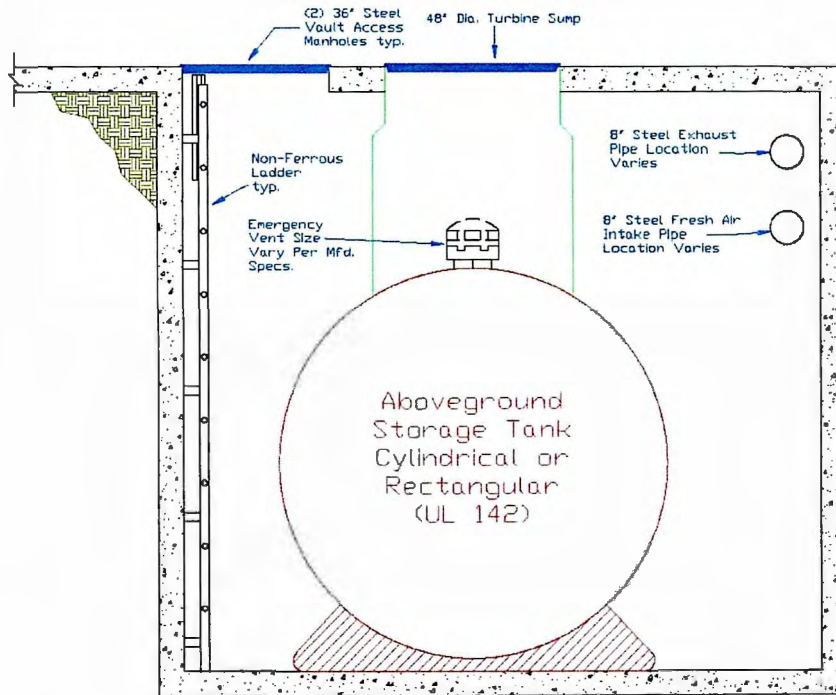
Sectional Views of Typical Vaulted AST (Ventilation)
